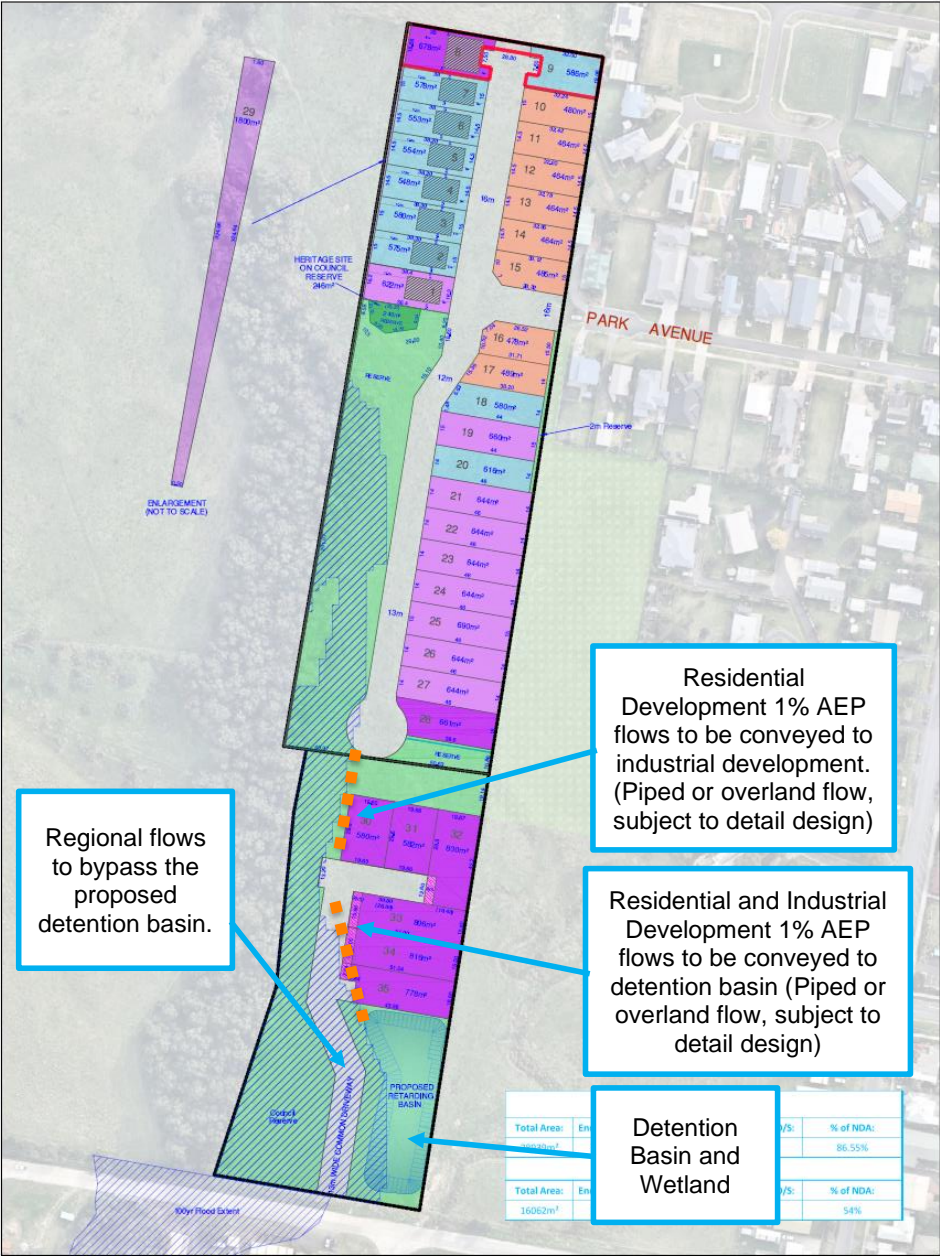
Amended Development Layout Additional Stormwater Drainage elements (extract from St Quentin development layout plan)
